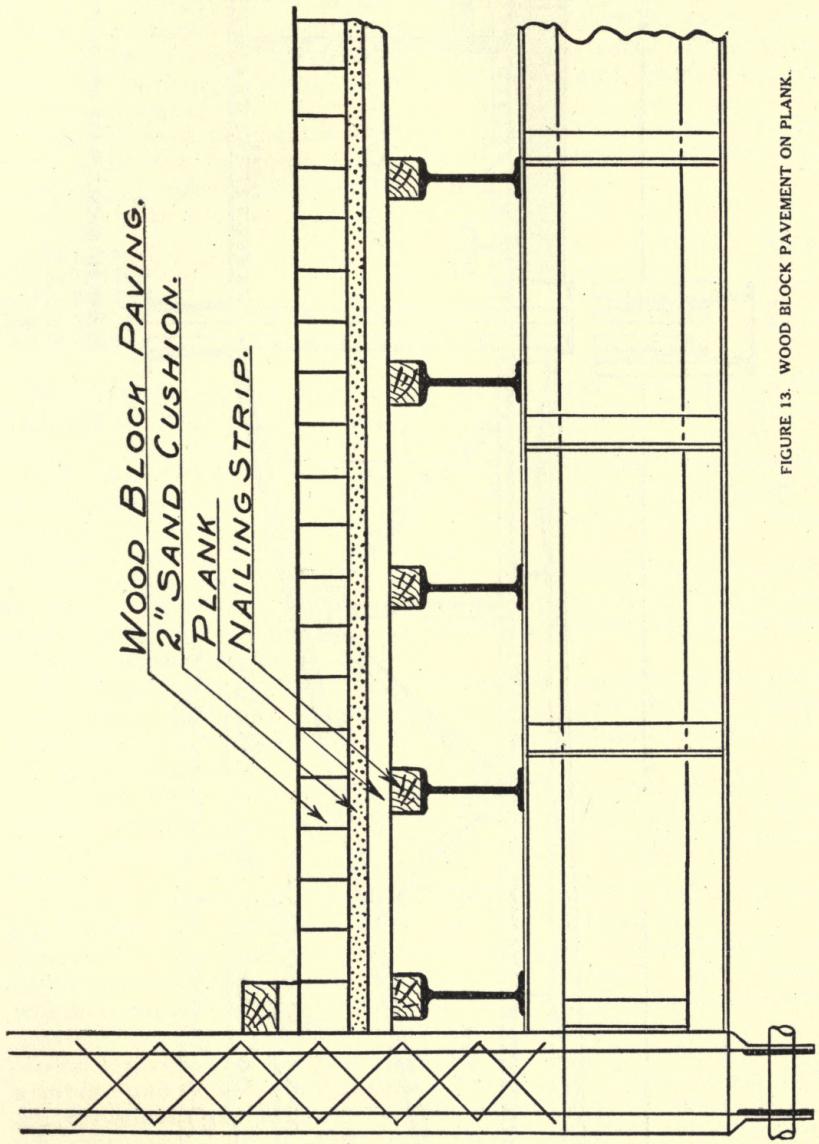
WOOD BLOCK PAVEMENT ON PLANK.
